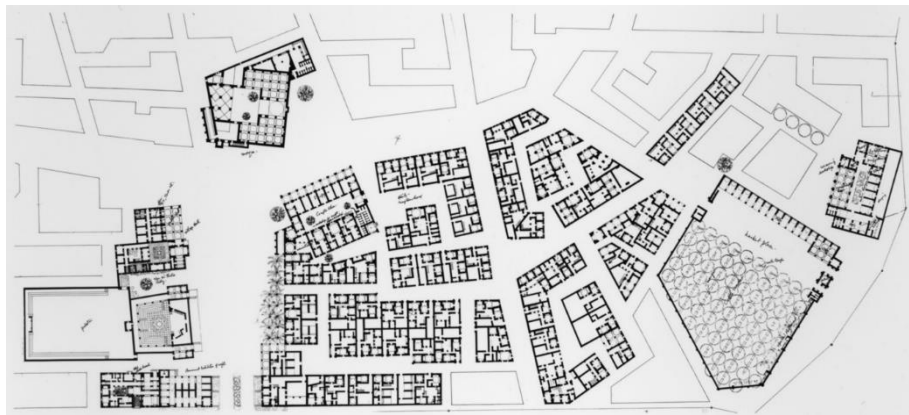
New Gournia Village Plan (1945-1948) by Hassan Fathy, southern corner of community, floor plans of family neighbourhood buildings. Source: Aga Khan Visual Archive. Photo available at: [https://dome.mit.edu/bitstream/handle/1721.3/73766/157468\\_sv.jp](https://dome.mit.edu/bitstream/handle/1721.3/73766/157468_sv.jp)
